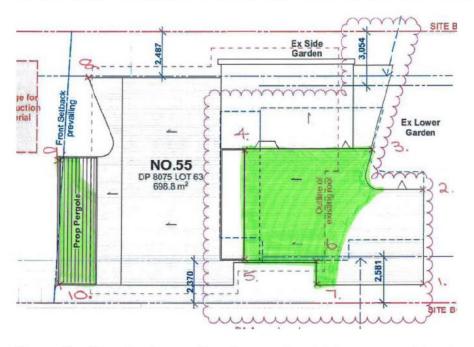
Plan showing roof locations under which survey spot levels were identified and building height breaching roof elements shown shaded green
